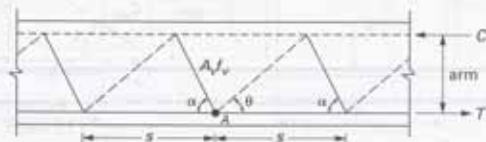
Truss model for a beam with inclined stirrups.
